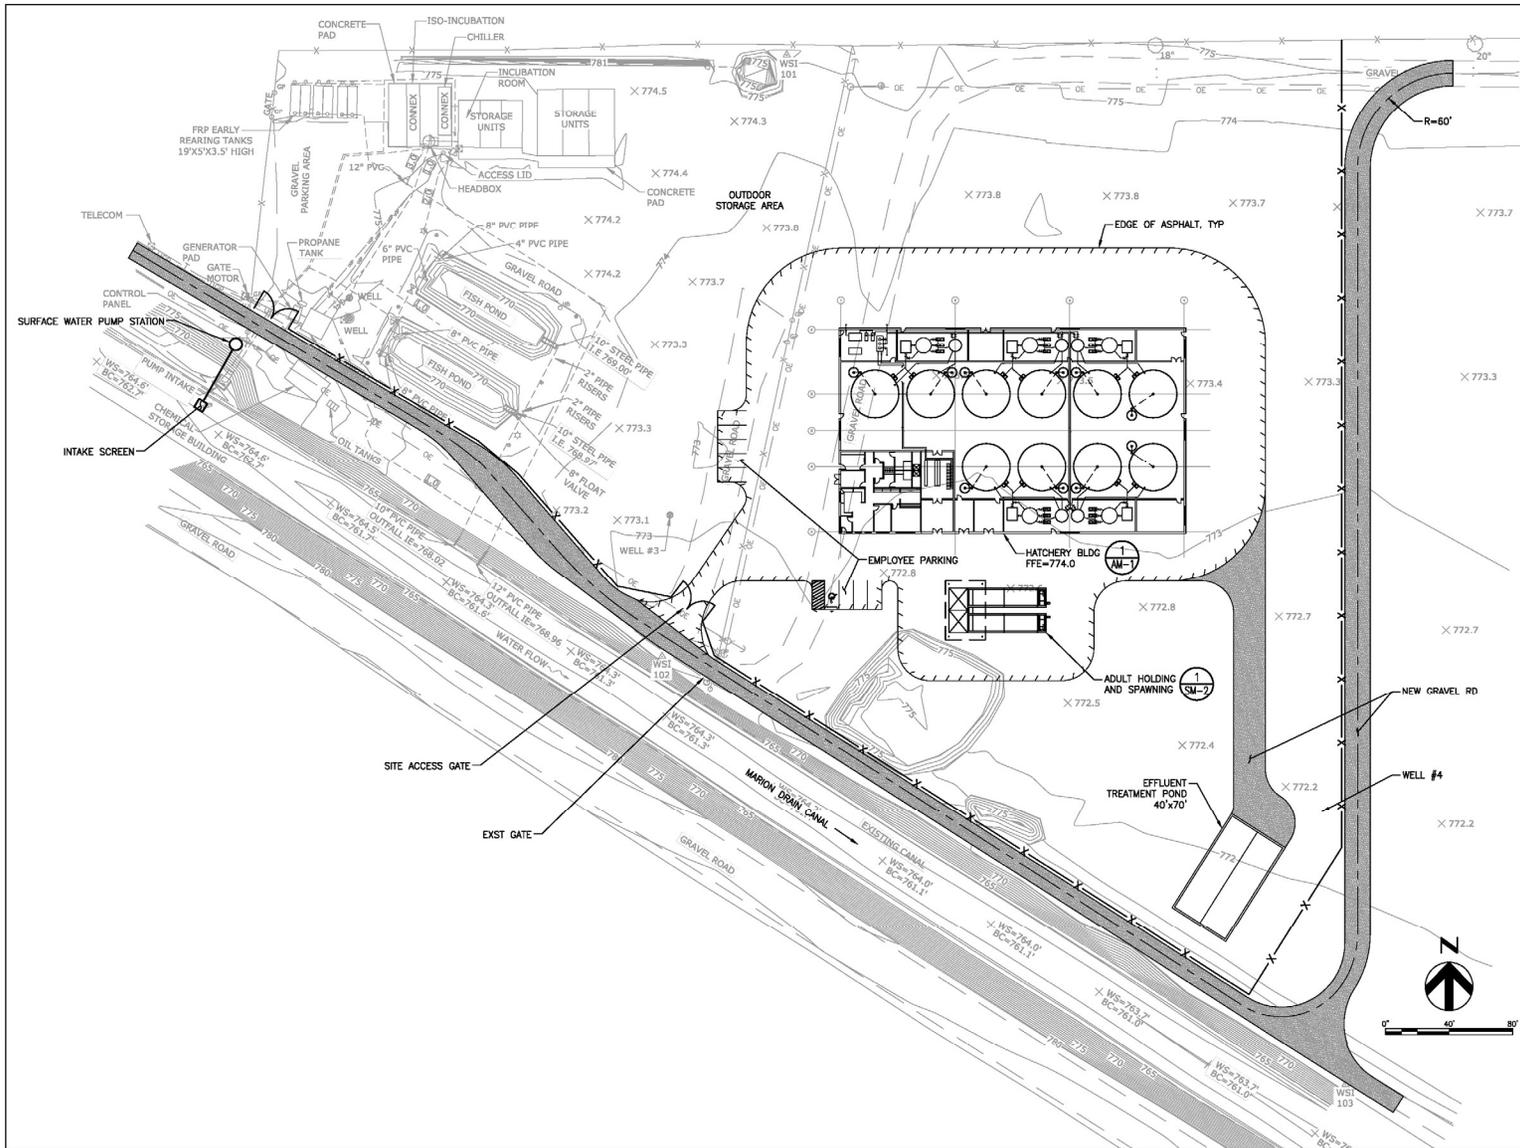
Marion Drain Hatchery proposed facility plan.
